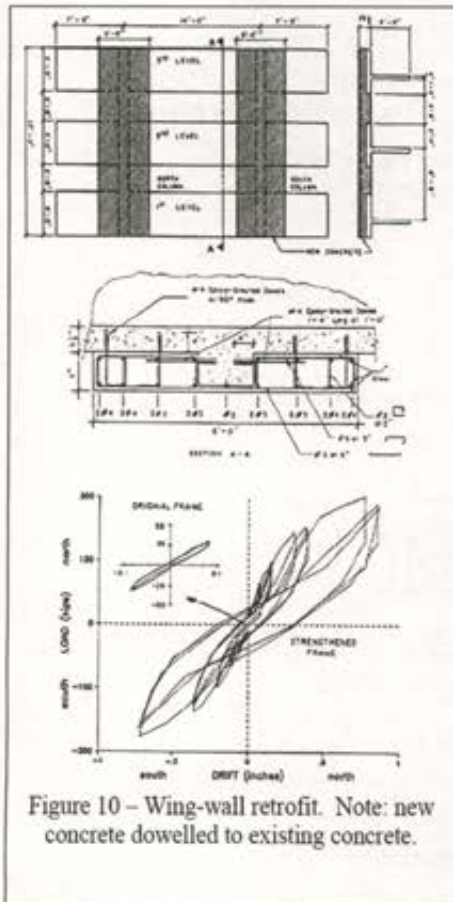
Wing-wall retrofit. Note: new concrete dowelled to existing concrete.
